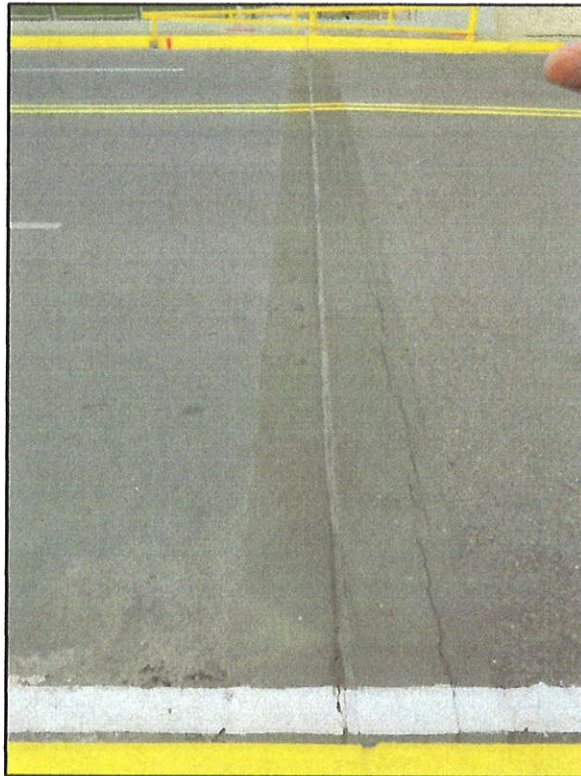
B shows the bent 3 expansion joint. Note the depressed rubber seal and gap in the joint as well as cracked concrete at the joint.
